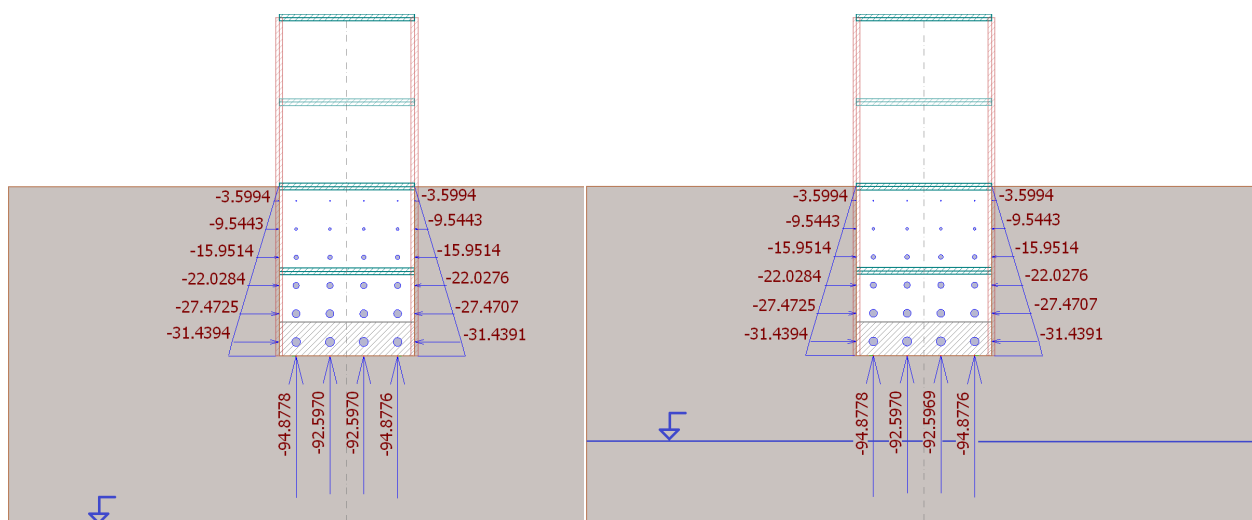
The total horizontal pressures (connection forces) on the walls in [kPa]
